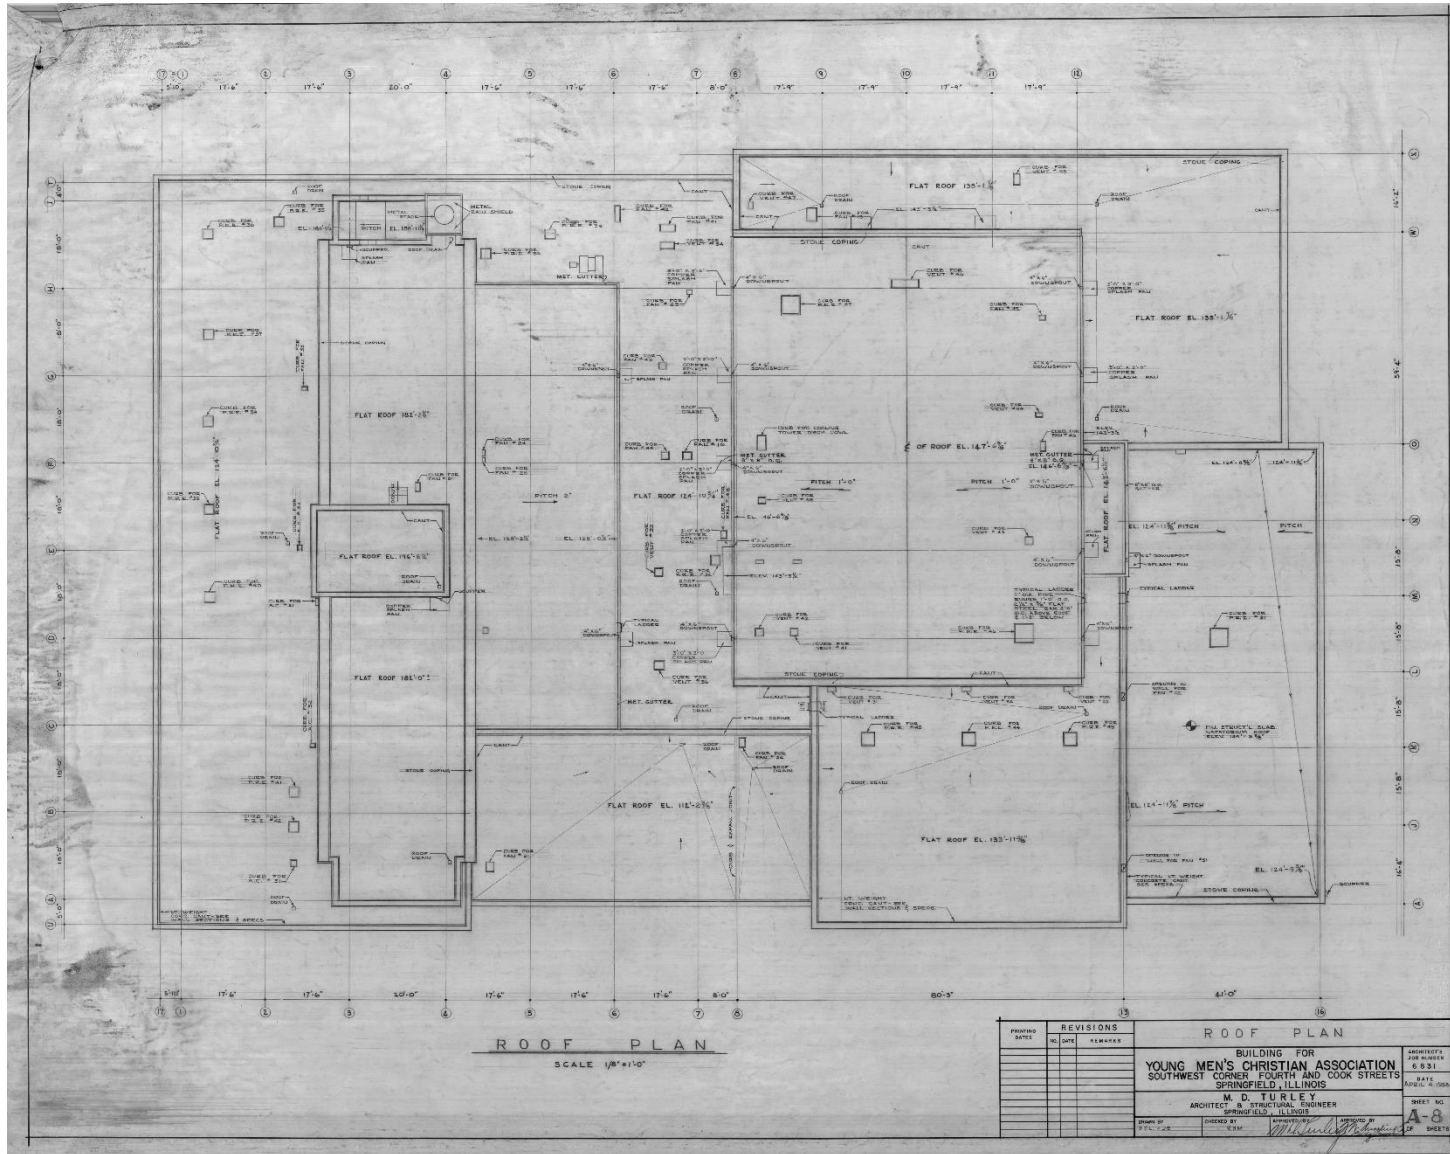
Roof Plan, Building for Young Men's Christian Association (Turley 1958: Sheet No. A-8).
